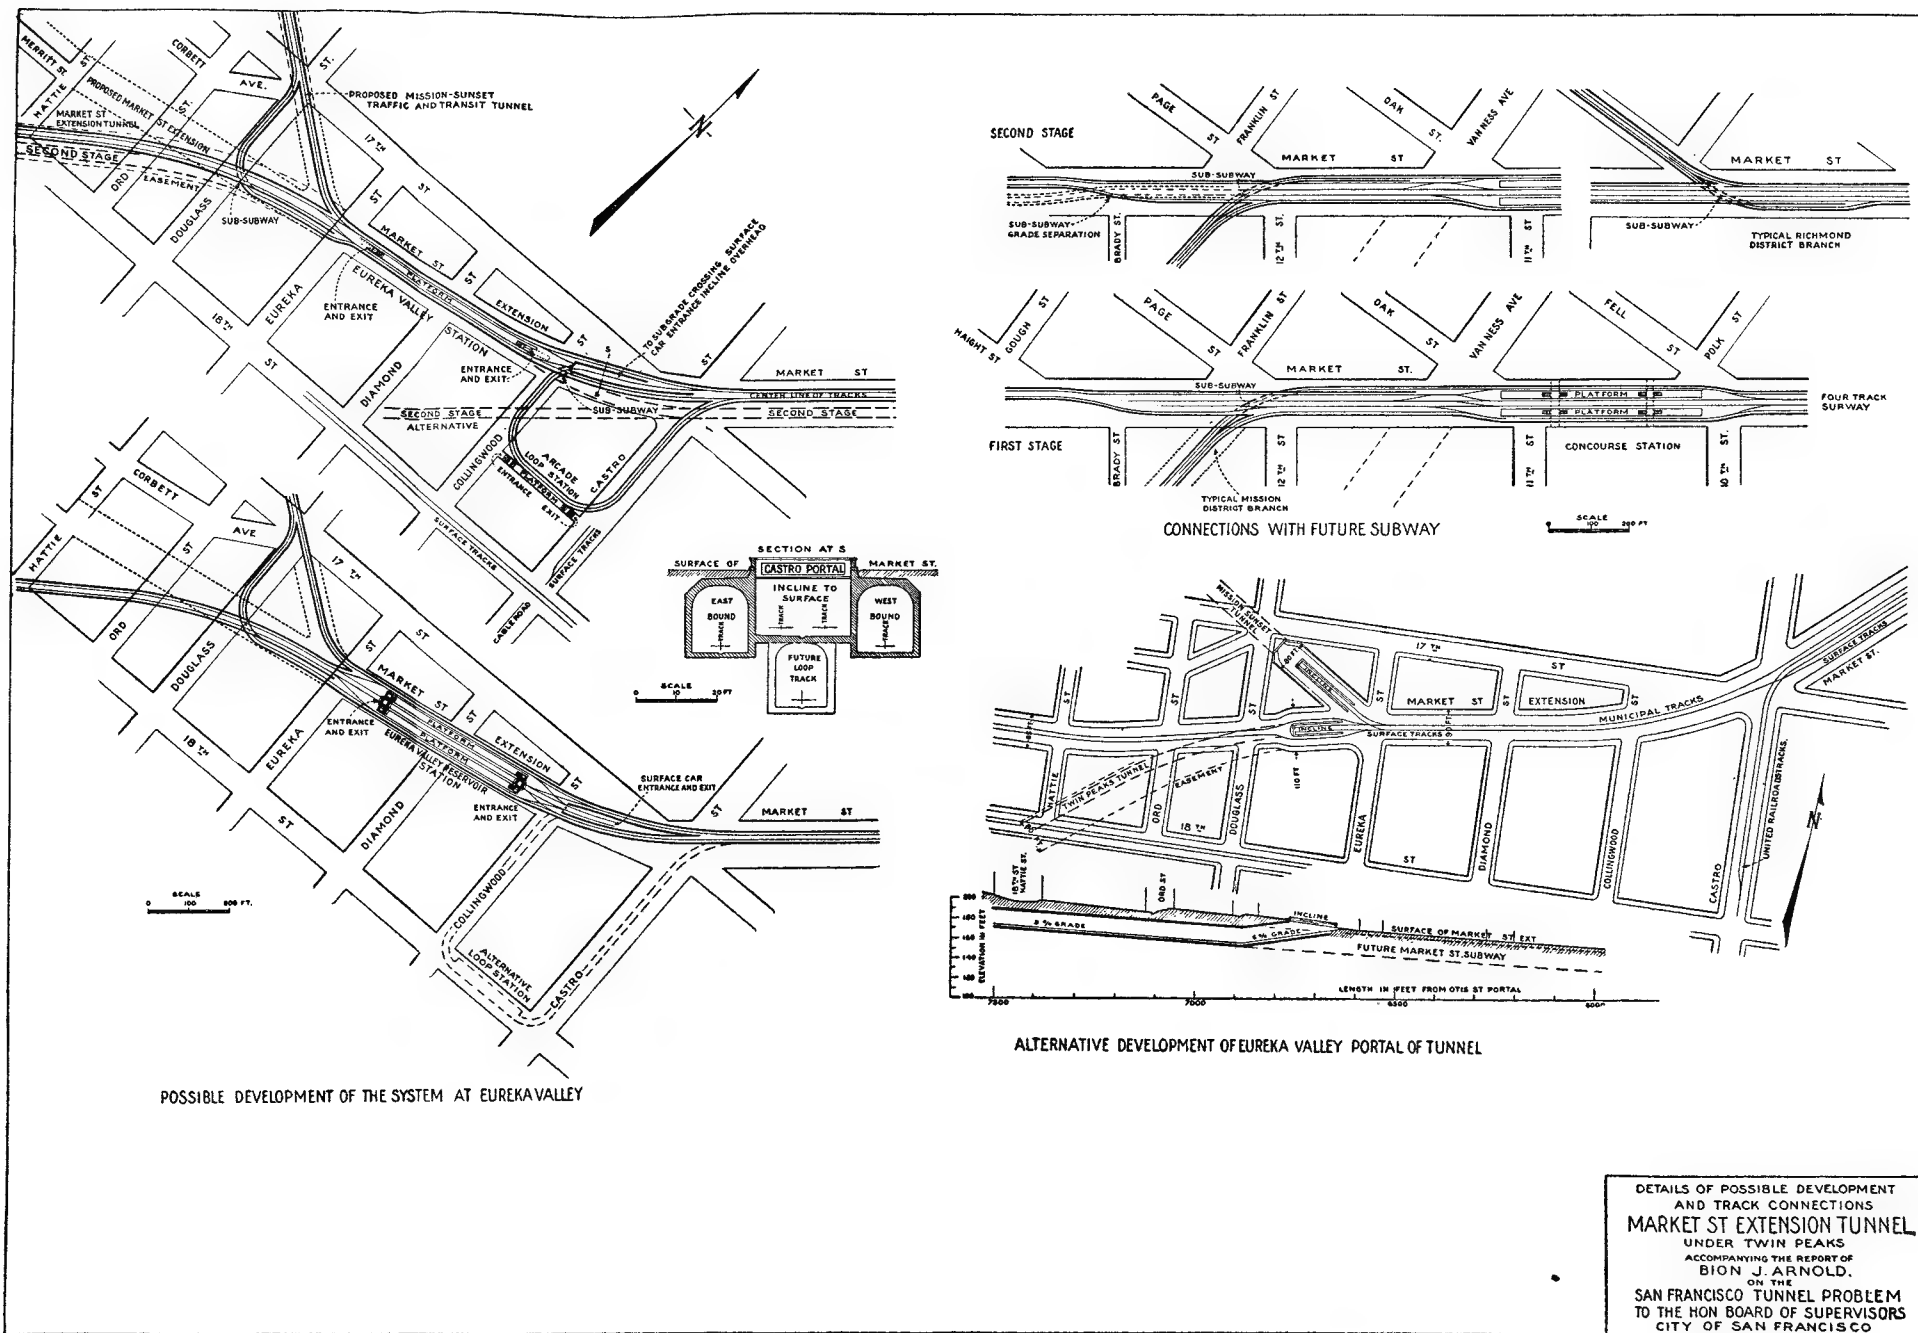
ALTERNATIVE PLAN AND DETAILS OF MARKET STREET EXTENSION TUNNEL.
